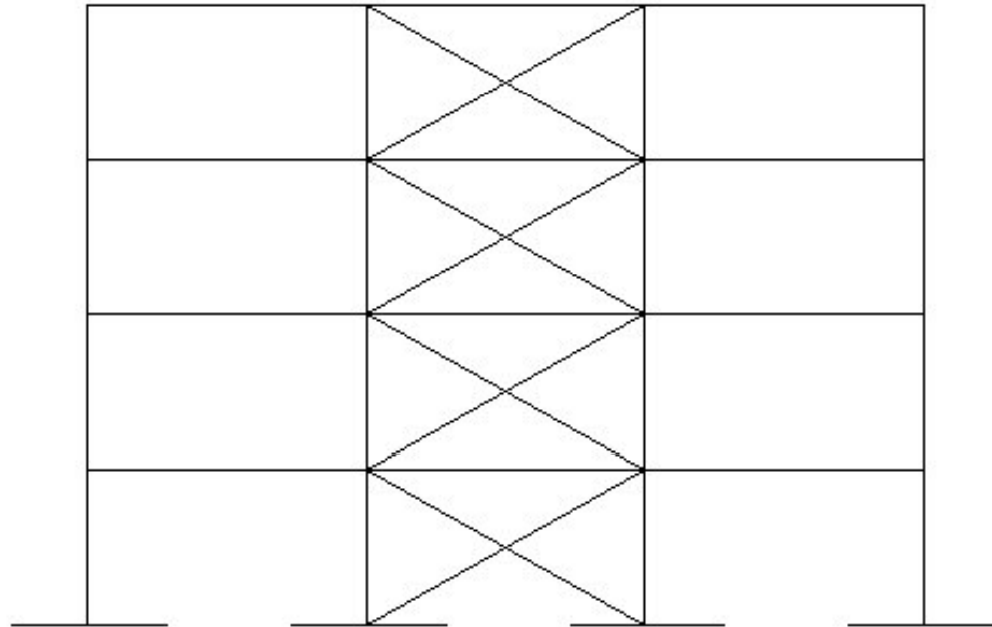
Braced frame (but may be a sway frame if bracing is very flexible).
